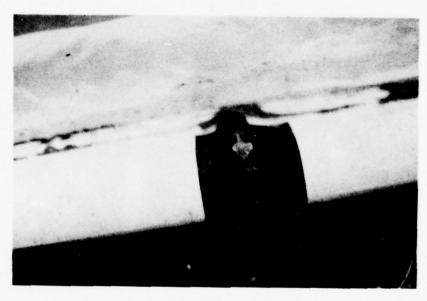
Detail of stakes and PVC pipe used as membrane tie-downs.
